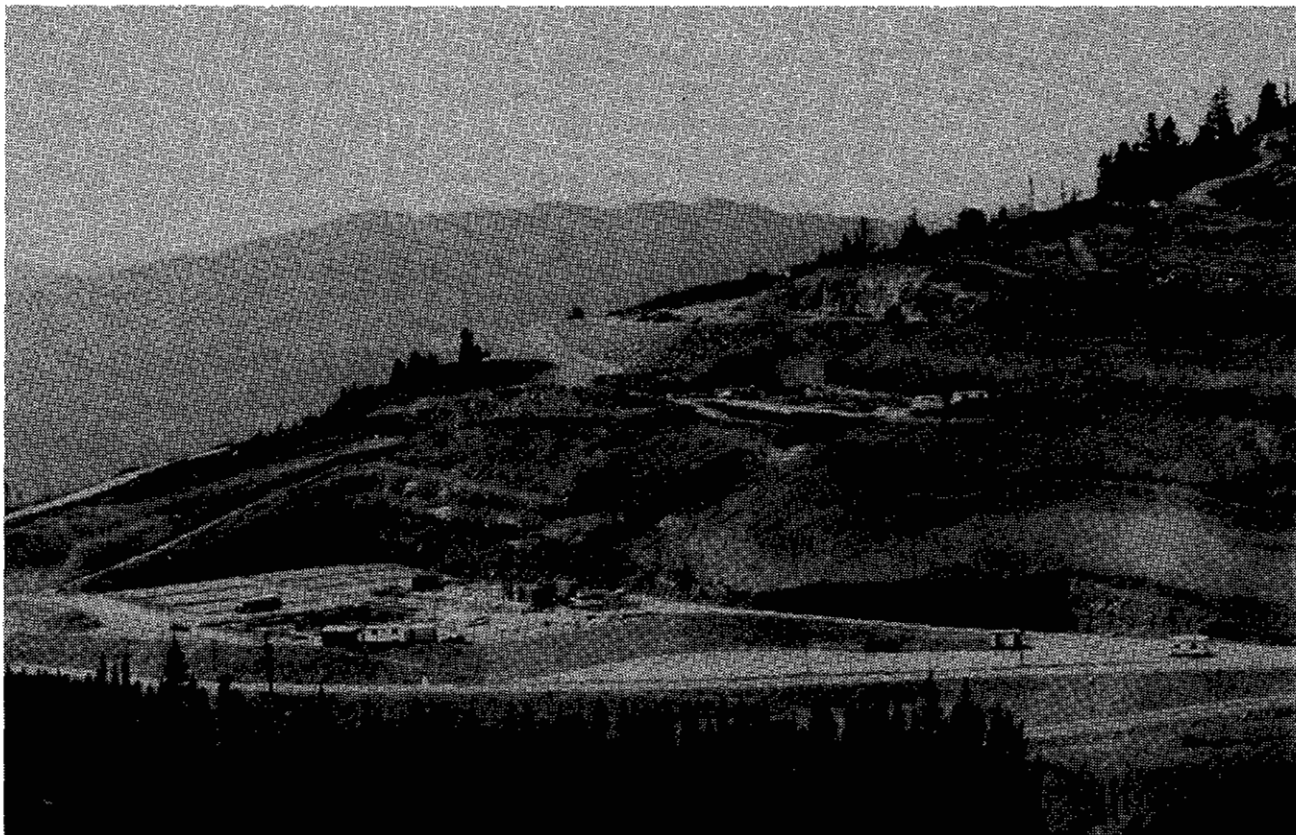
View of the Nickel Plate mill and mine site under construction in 1987. Photo taken looking southwest.
